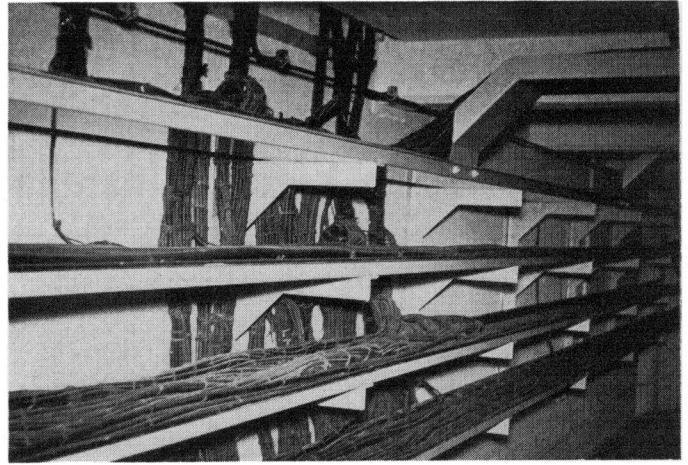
Sheet steel troughs mounted on wall, Moraga Substation, East Bay Division
